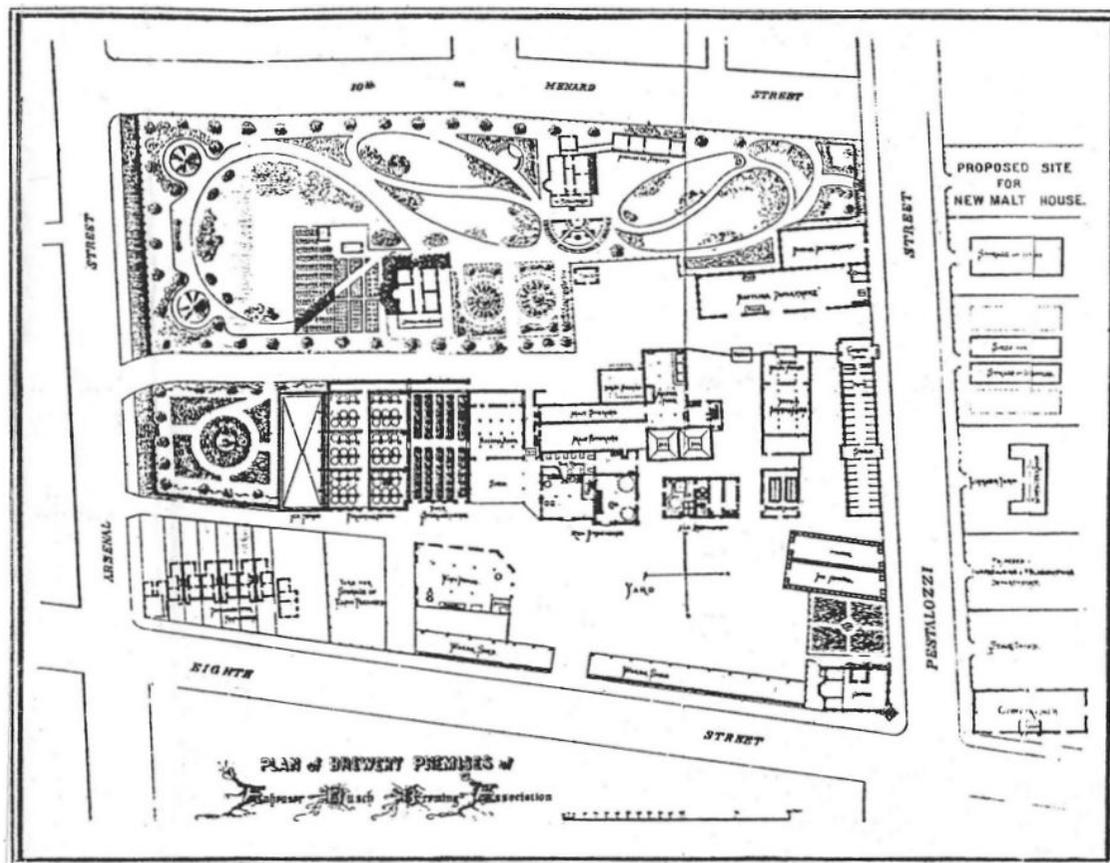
Edmund Jungenfeld, architect: Site plan, Anheuser-Busch Brewing Association, St. Louis, 1879. Source: *The Western Brewer*. IV, 12, detail of unpagged supplement.
